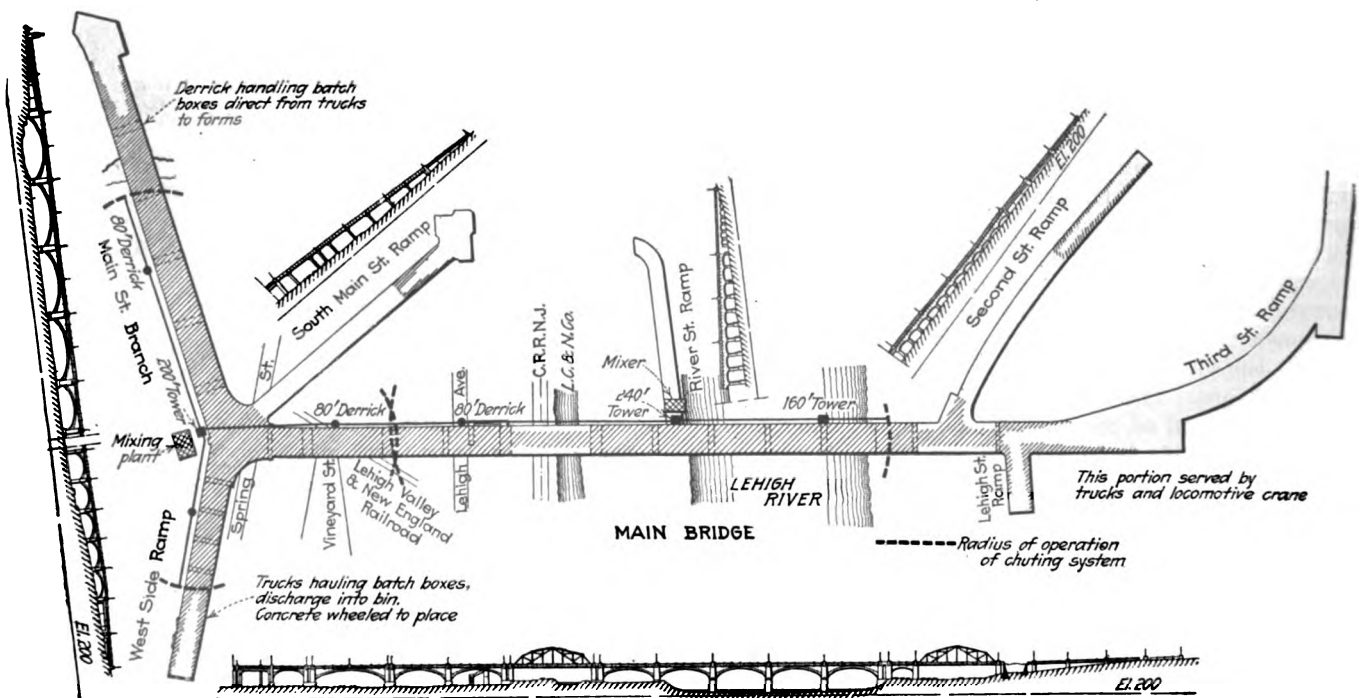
PLAN OF BRIDGE SHOWING METHODS OF CONCRETE PLACEMENT USED
